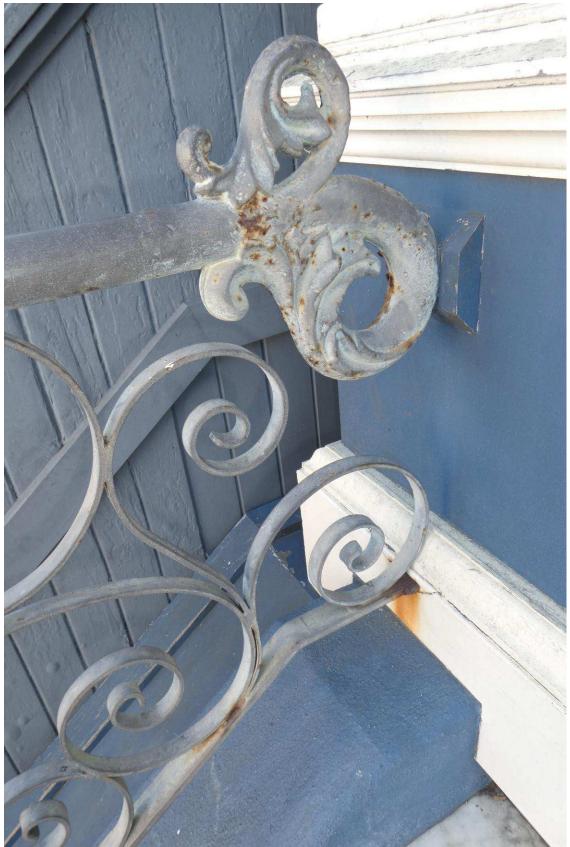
Detail of typical corrosion at the wrought and cast iron stair rail.
